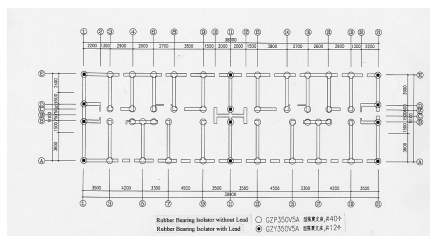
Floor Plan Showing the Layout of Isolation Devices
